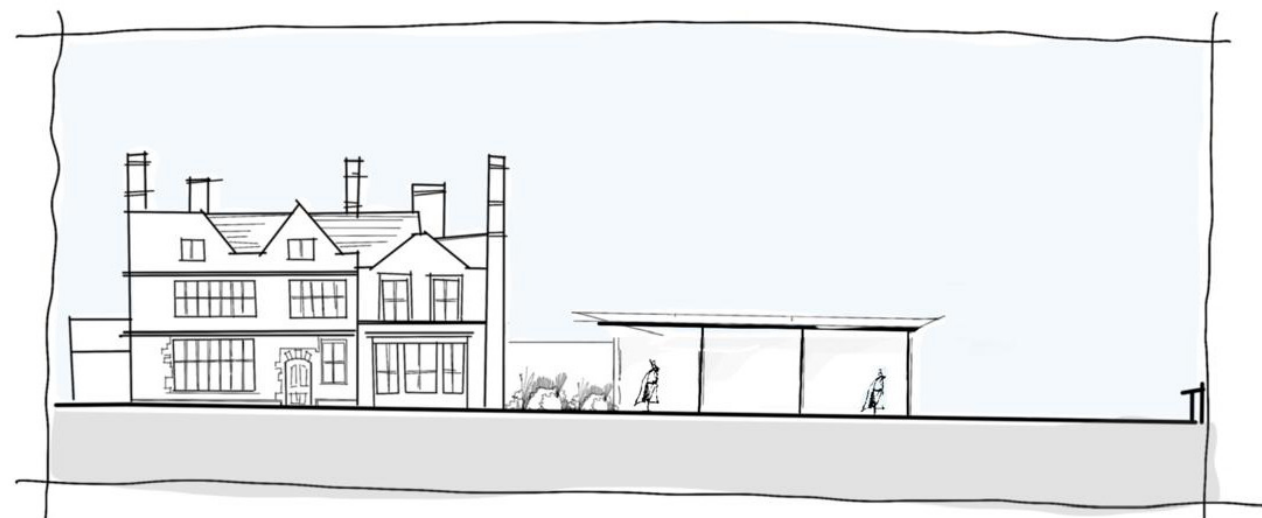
Hand Sketch of Principal Elevation showing the proposed glass connection and pavilion
